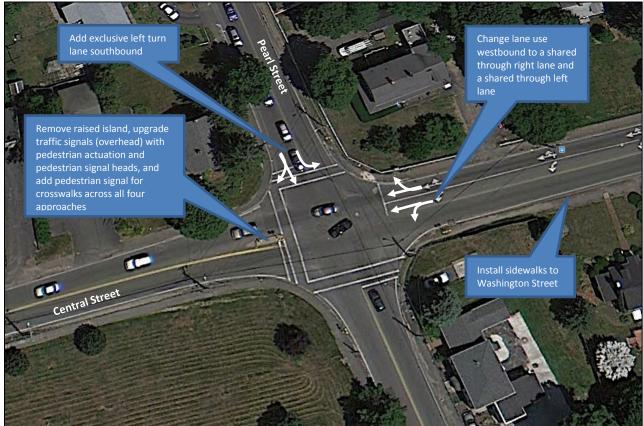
Recommended Improvements at Central Street/Pearl Street Intersection
